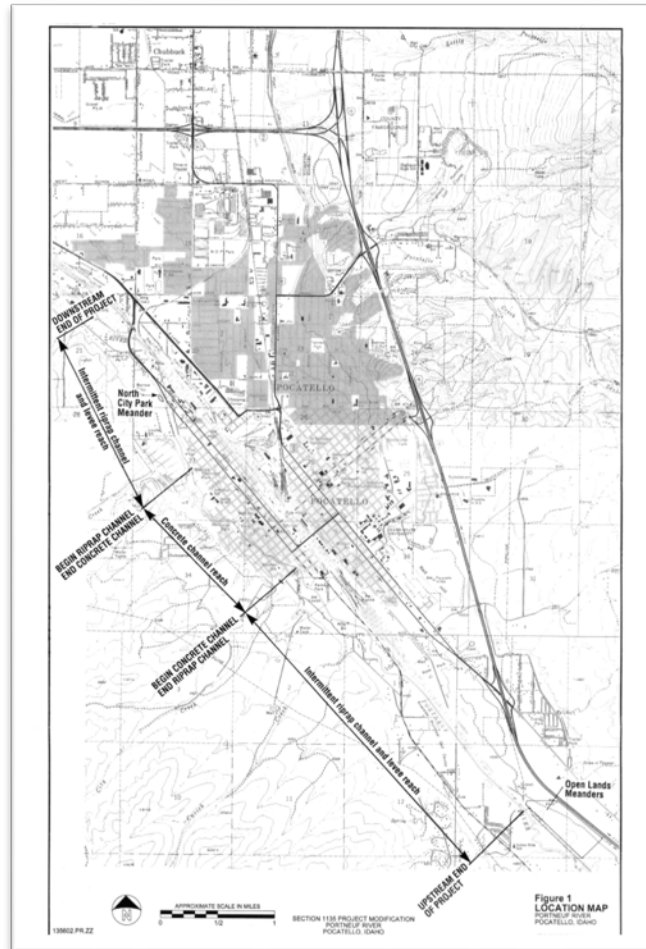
Flood Control Project Site Plan (from 1135 report)
